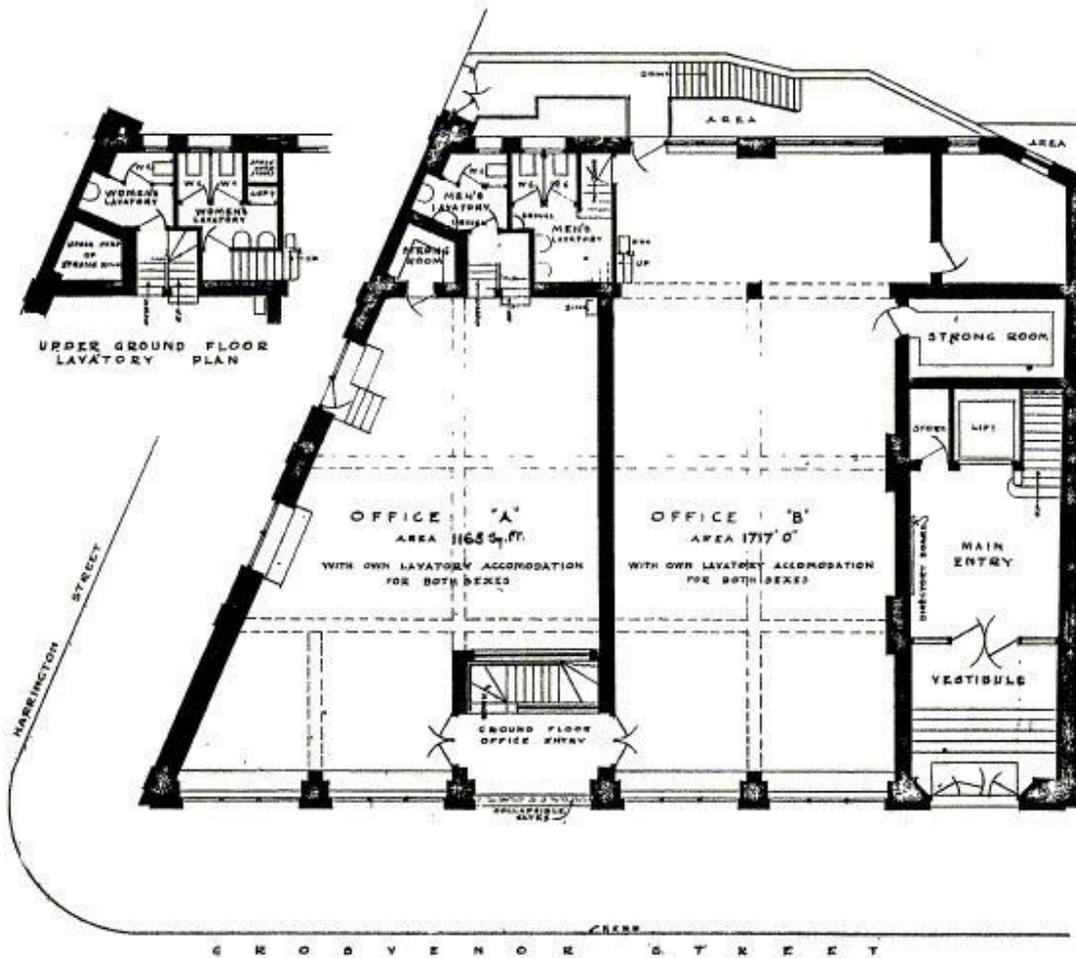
Plan of the proposed interior prepared by Ernest A. Scott & Green c.1922
